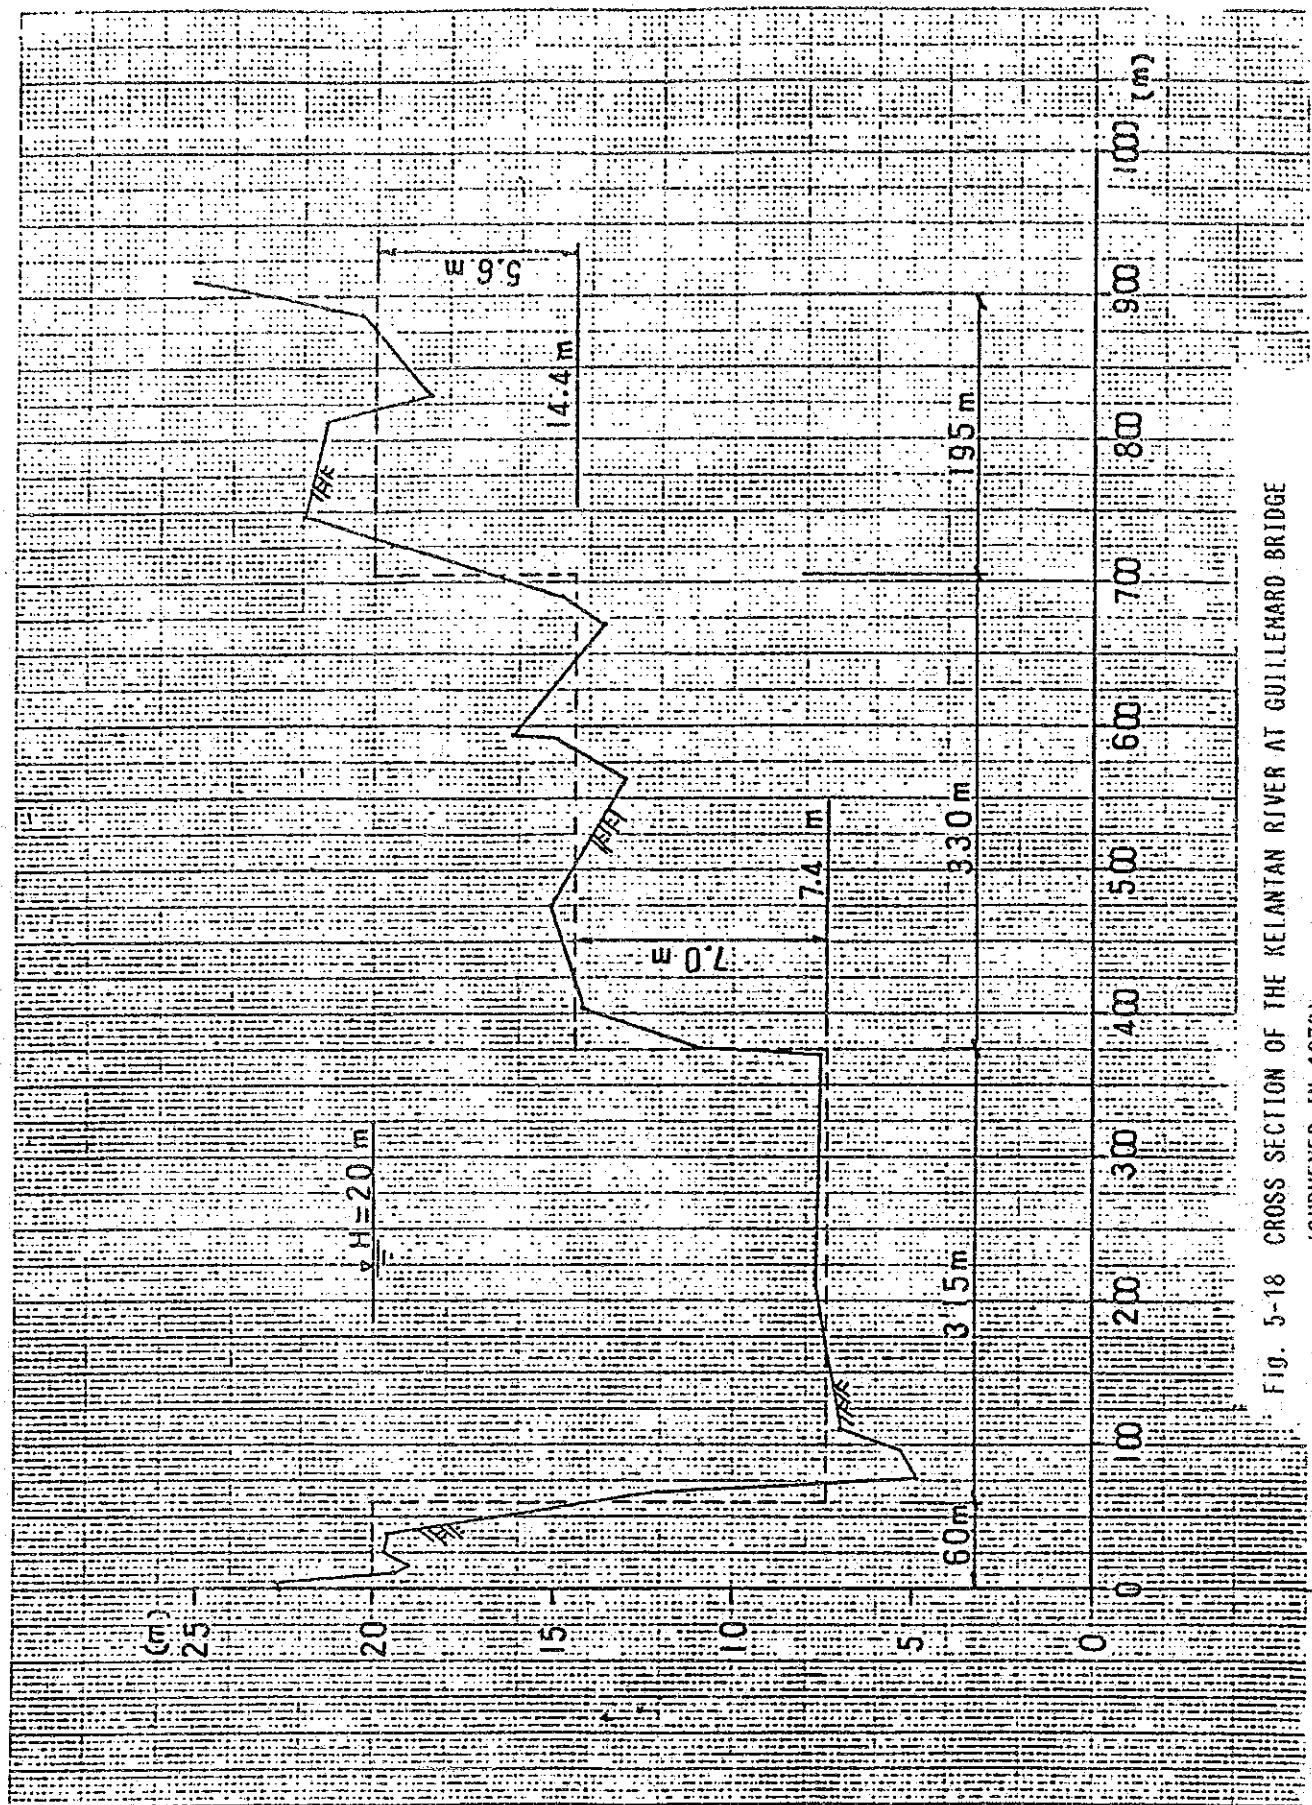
CROSS SECTION OF THE KELANTAN RIVER AT GUILLEMAR BRIDGE
